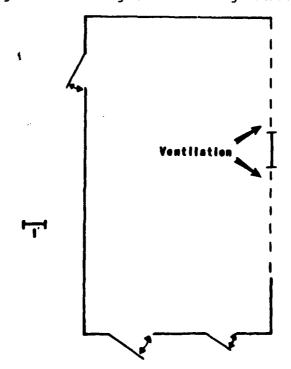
Cunningham outbuilding. Plan of Chicken House.
